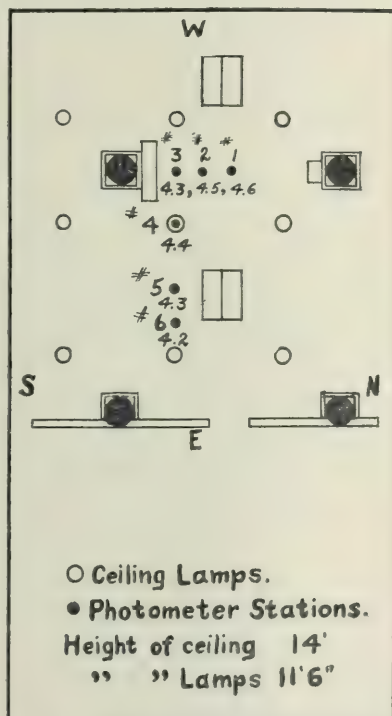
Section plan of third floor, (ladies' reception room), showing location of furniture, pillars, lighting units, test stations and illumination data.
